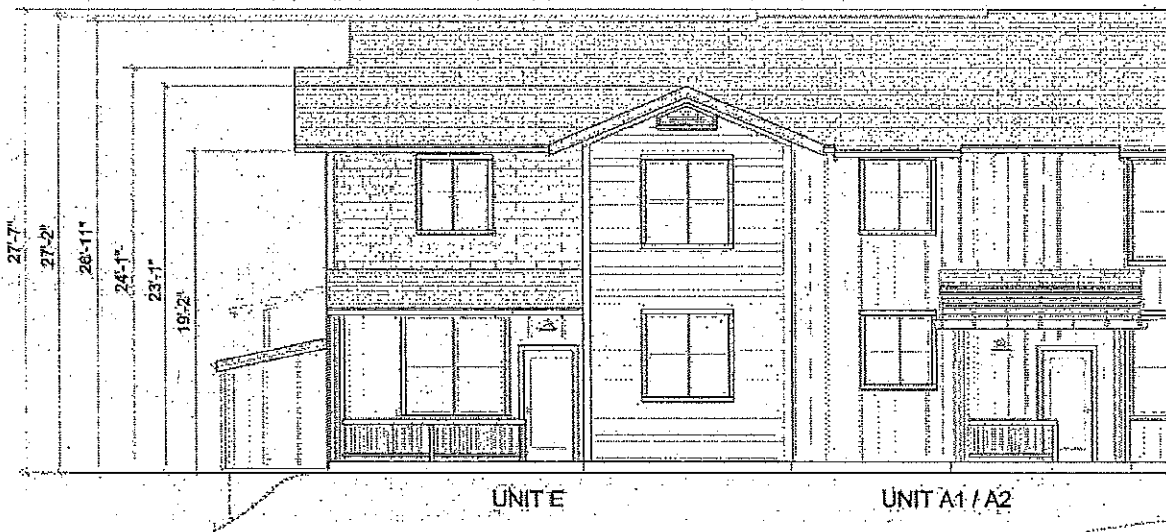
Portion of Typical North Elevation of Buildings 1 & 2 on lot #400 with proposed heights for the Oakleigh Meadow Cohousing project.
